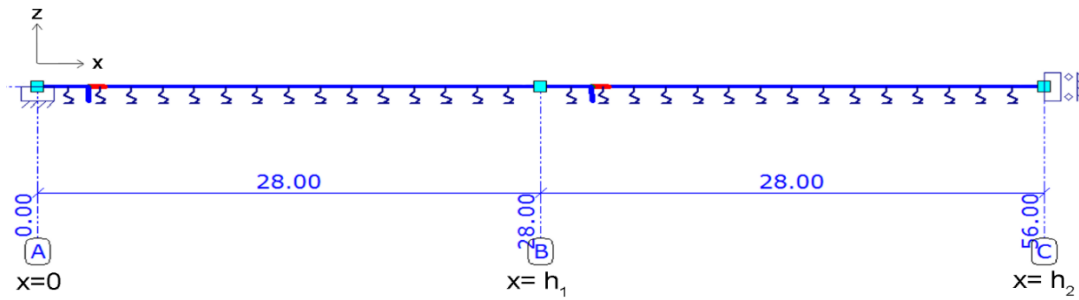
Horizontal rotated wall (girder on elastic foundation)
